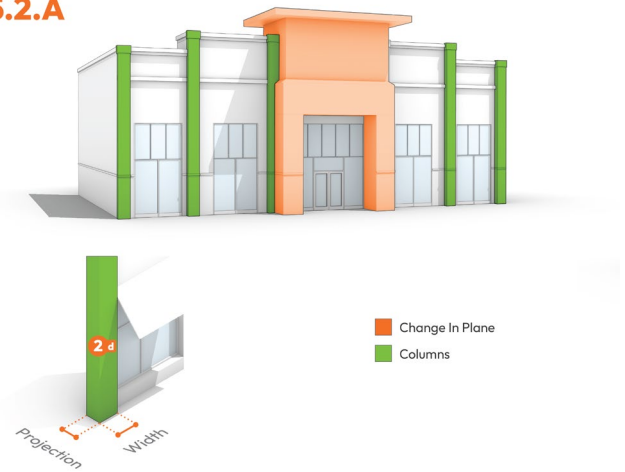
Front and Street Side Façade Articulation Requirements - Single Tenant / Common Entrance Building
